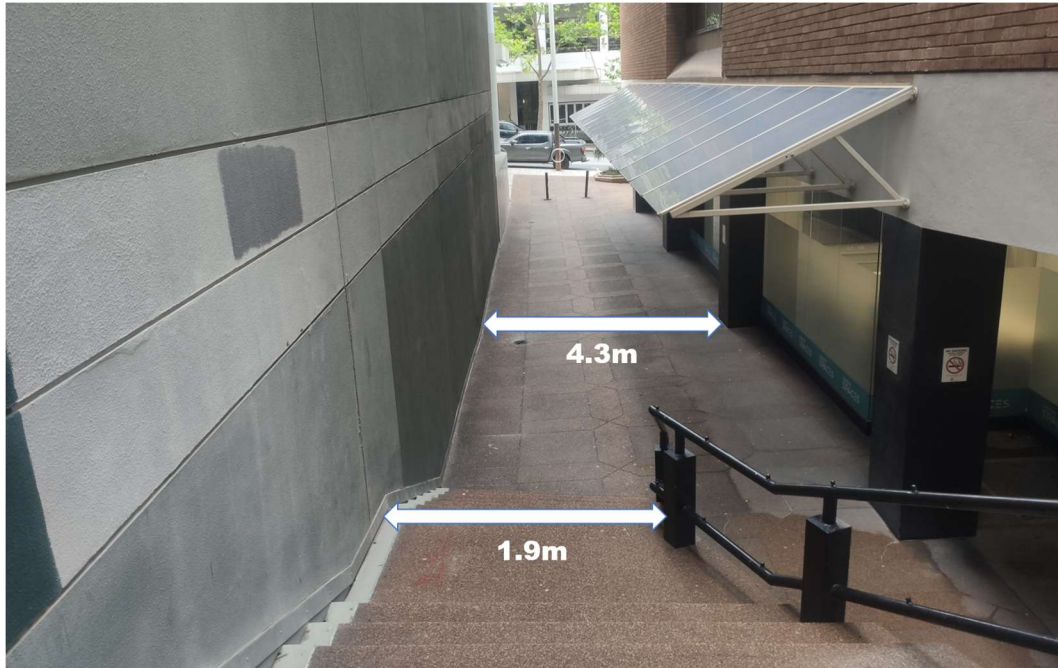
100/110 Walker through site link measurements (photo taken facing Walker Street) Source: Arup
